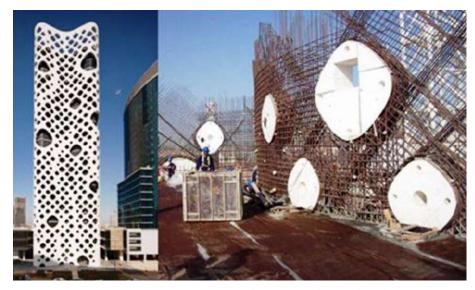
Concrete Diagrid, O-14 Building Dubai (left) and Construction of Diagrid (right) [15,16]
